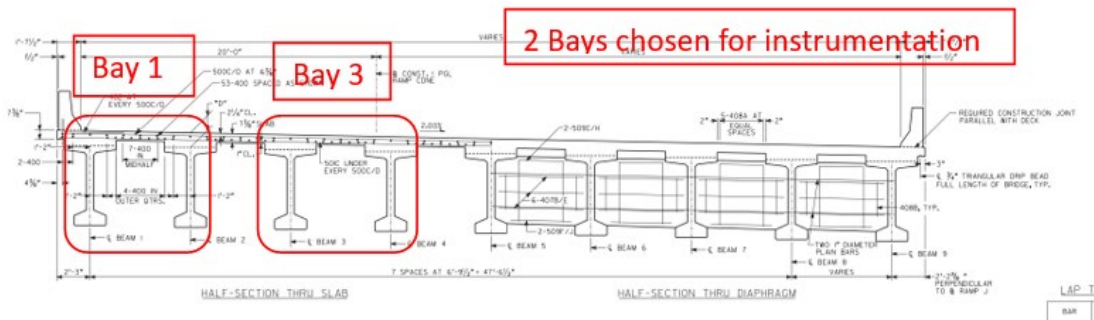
Drawings. Four Half-Section of Span 14, Bridge 11B
